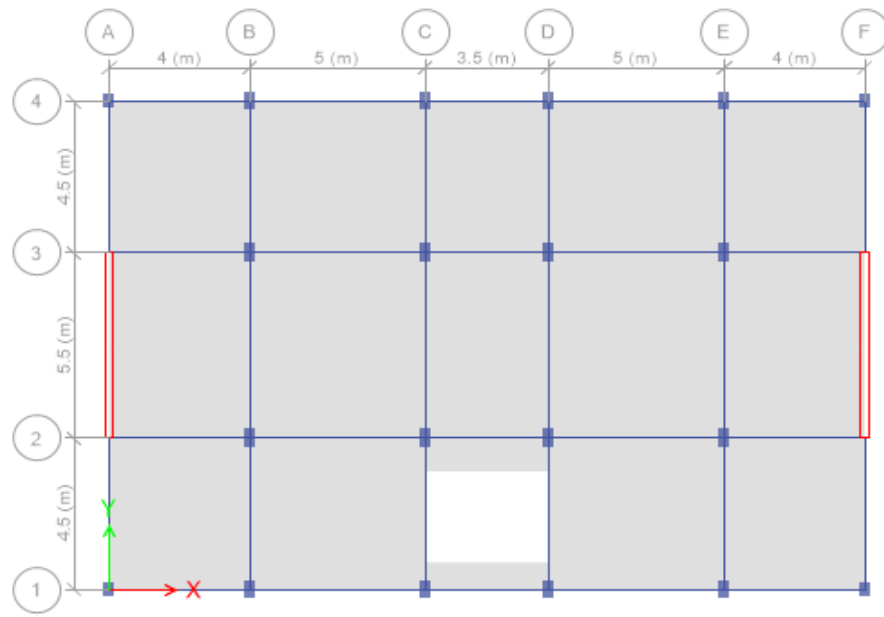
Floor plan for five story moment-resisting frame with shear wall by ETABS
